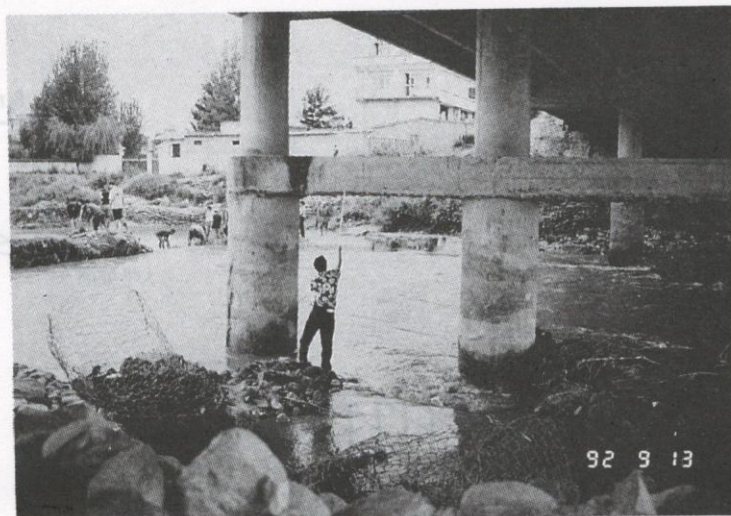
Exposure of Pile Foundation, Bagmati Bridge, Subidhanagar in 1992
